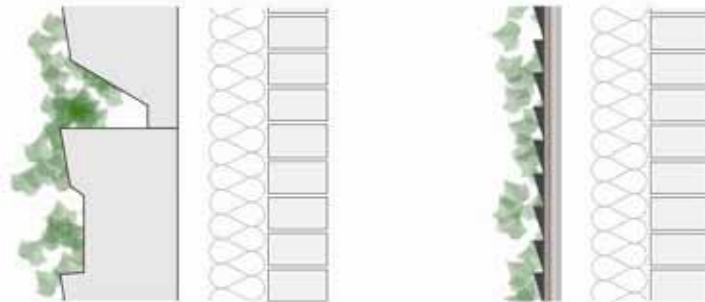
Living wall systems (based on planter boxes and based on felt layers) without the exterior masonry.
